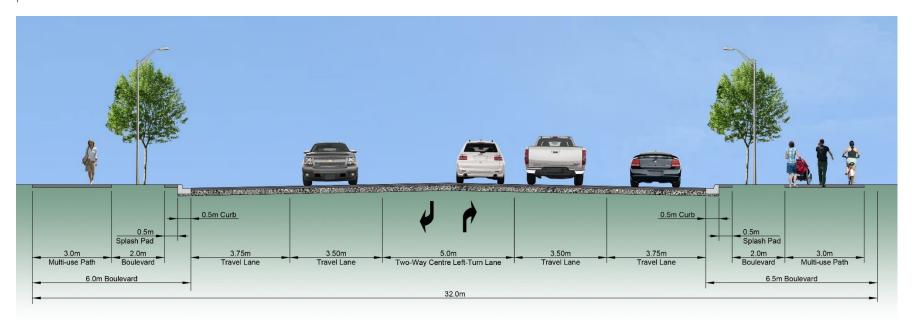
Roads A and E1 Typical Cross-Section
